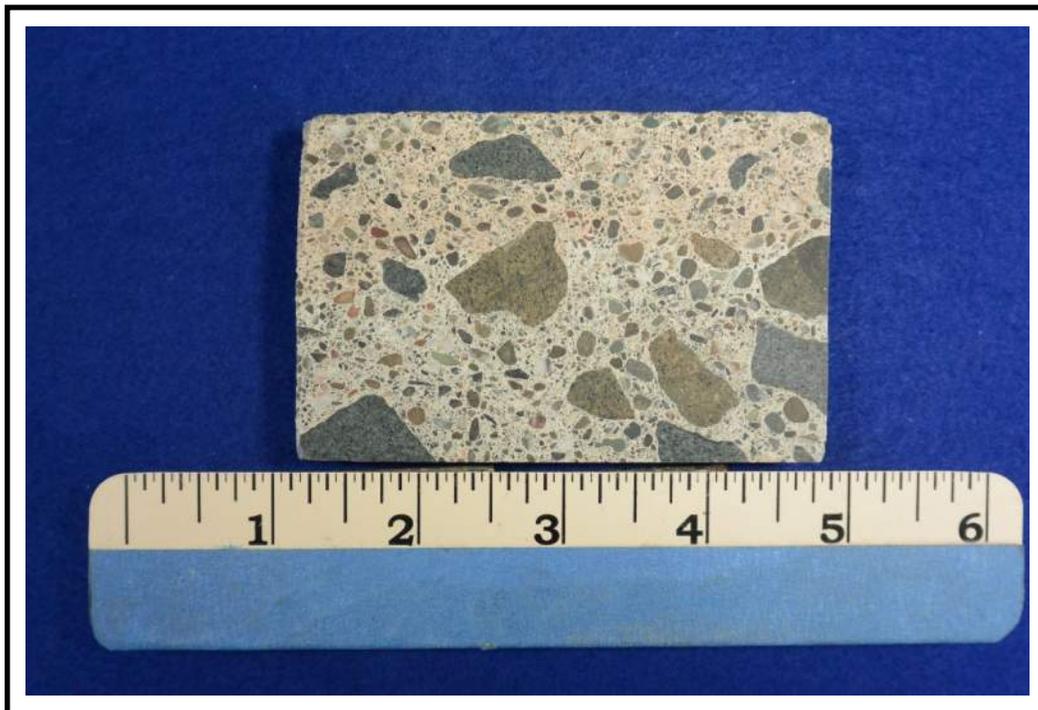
Lapped surface of core No. 14. Exposed surface at top of photo.
